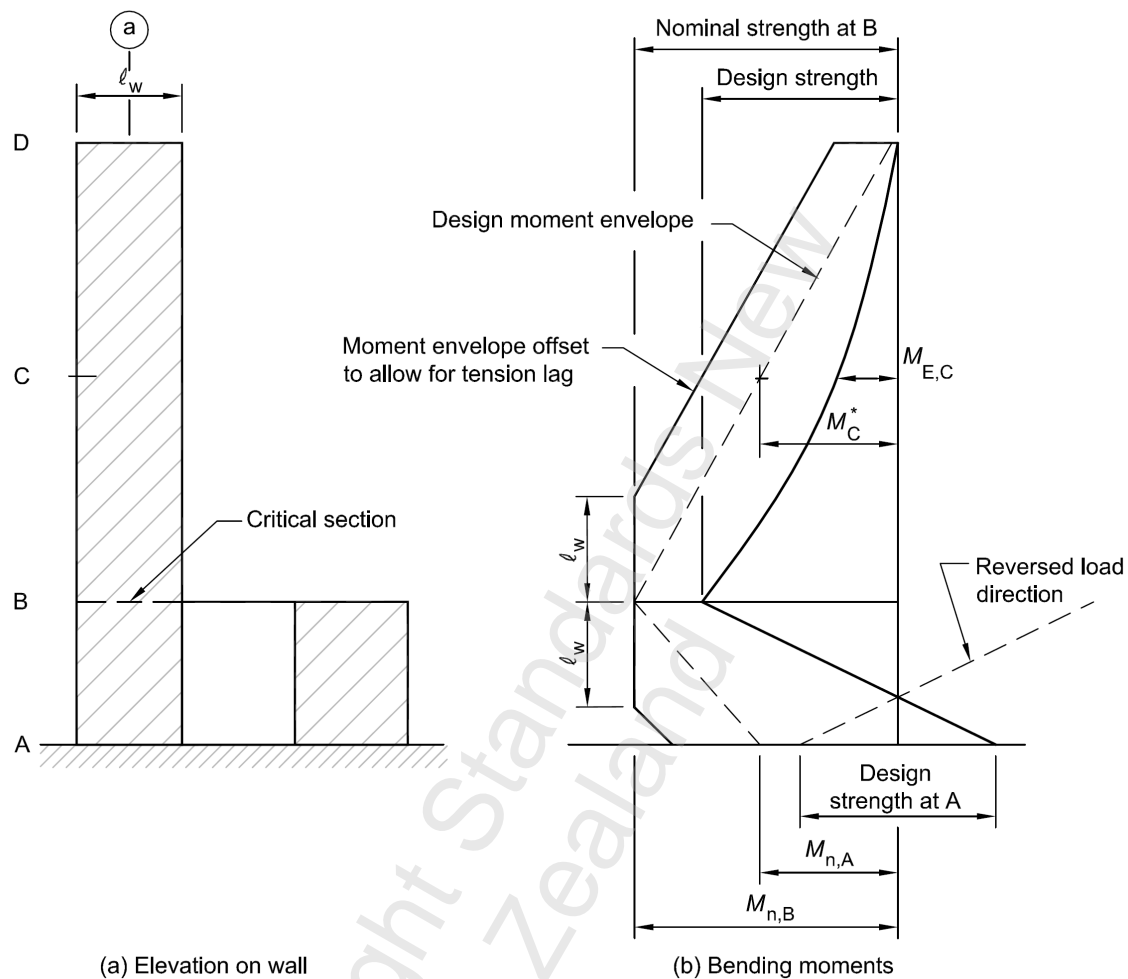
Capacity design bending moment envelope for a structural wall
